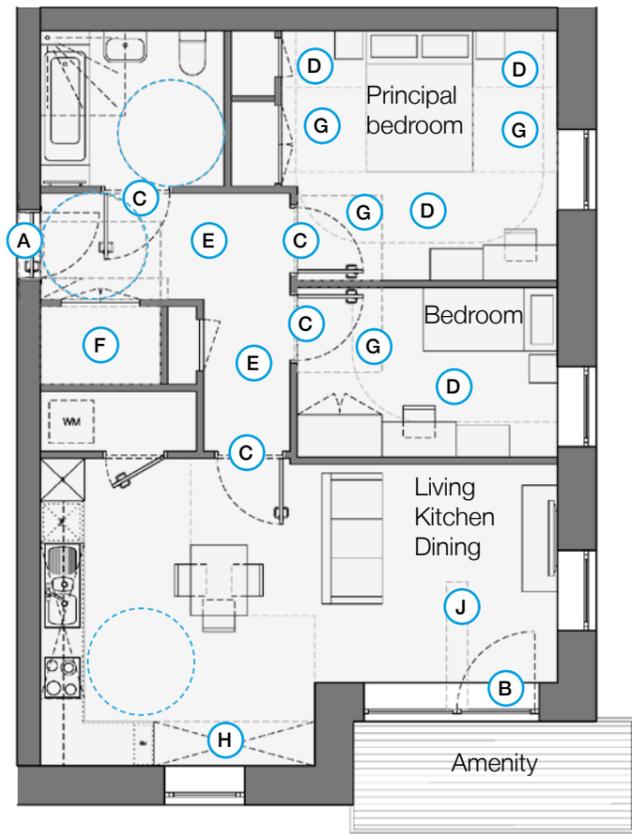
Typical 2 Bedroom 43 Persons accessible layout
